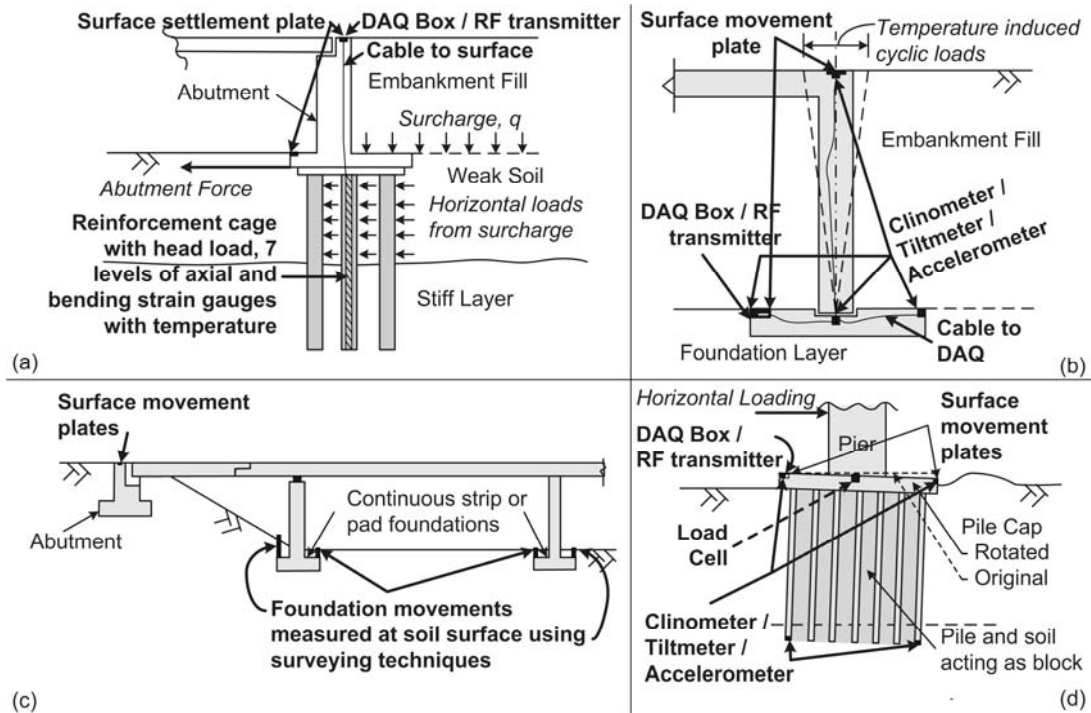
Conceptual instrumentation layouts (a) retaining wall supported on piles; (b) integral abutment on a shallow foundation; (c) near surface shallow foundation; (d) pile group
